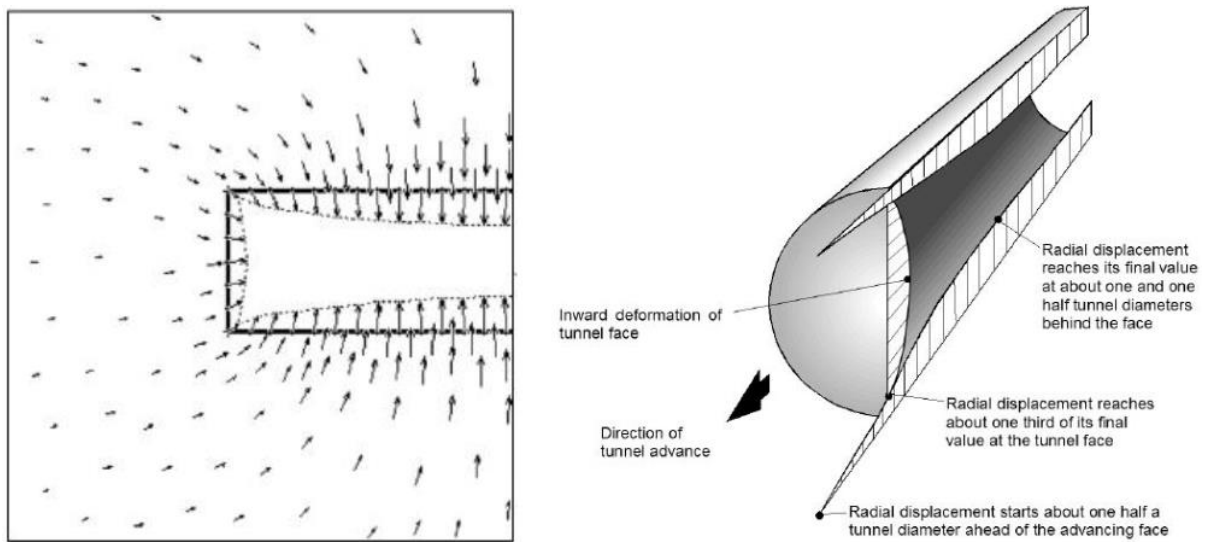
Shape of the deformed and the deformation tunnel outline
